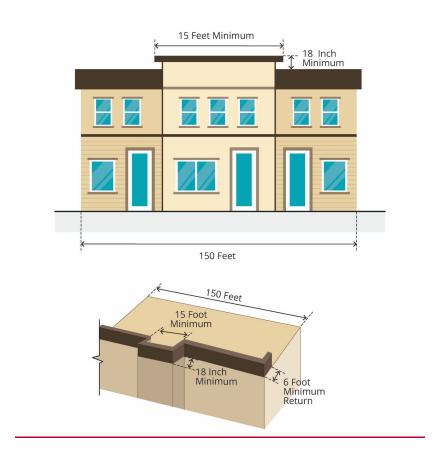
D MIXED USE BUILDINGS, ROOF LINE
